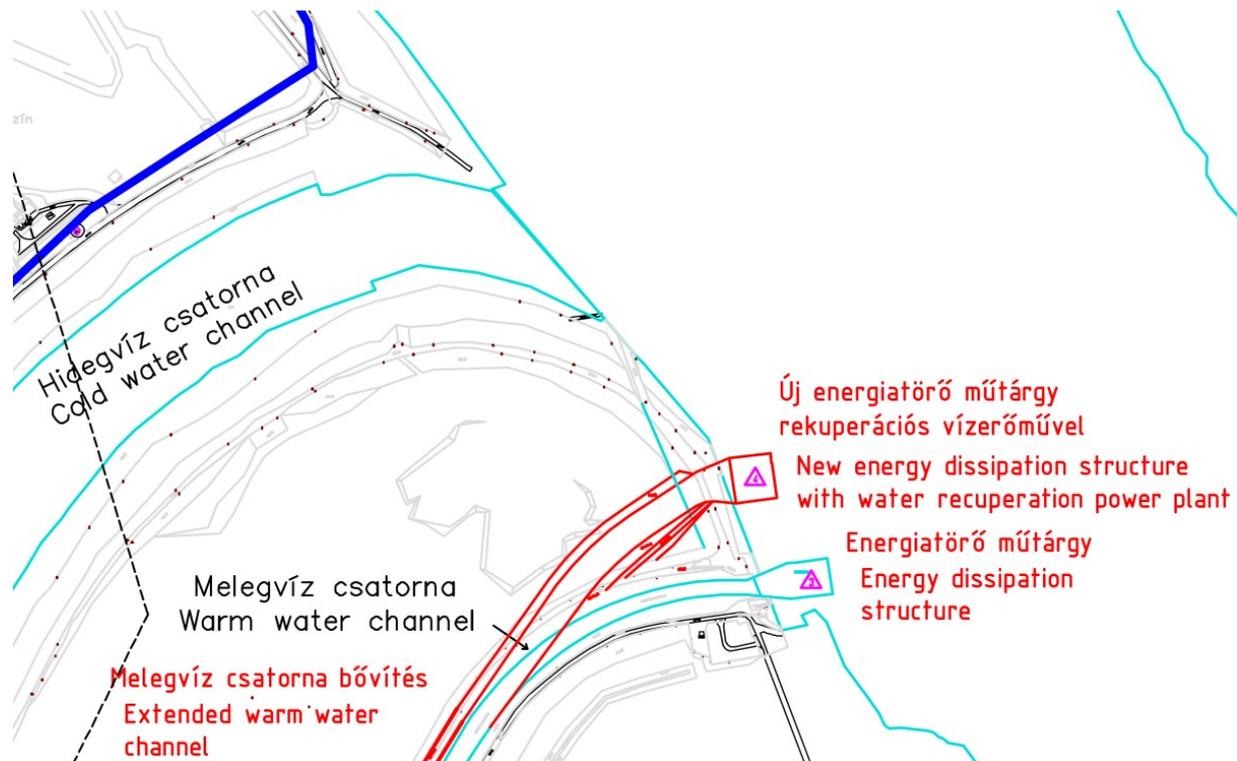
Site plan of the existing energy dissipation device and a second, new discharge point with a recovering hydroelectric plant
